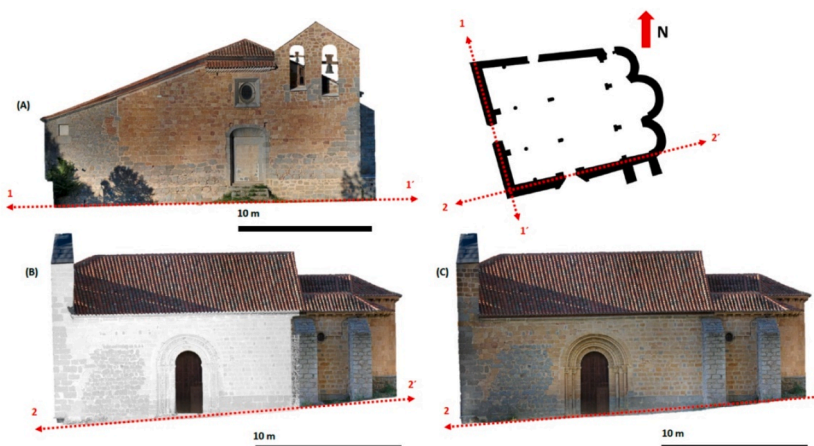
Orthophotos of the two main façades of the church. (A) South façade RGB orthophoto. (B) Intensity orthophoto of the TLS east façade. (C) East façade RGB orthophoto.
